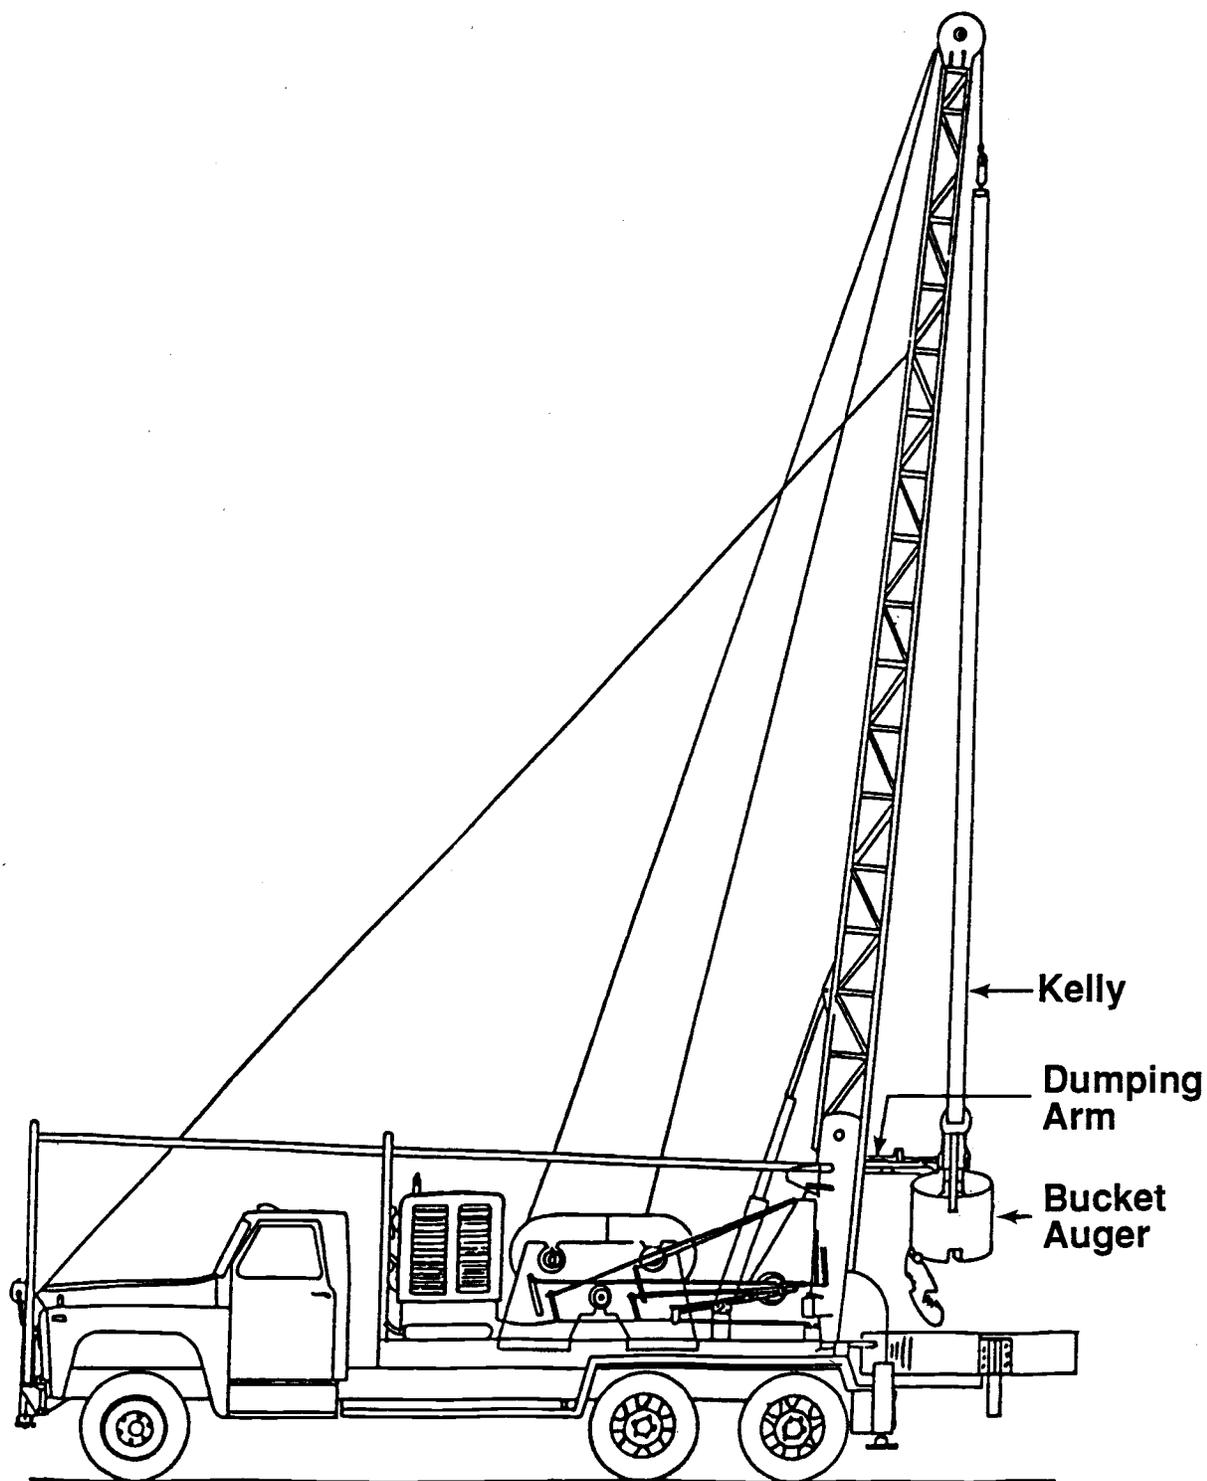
Bucket auger and drilling rig (after Calweld Drilling Co.)
